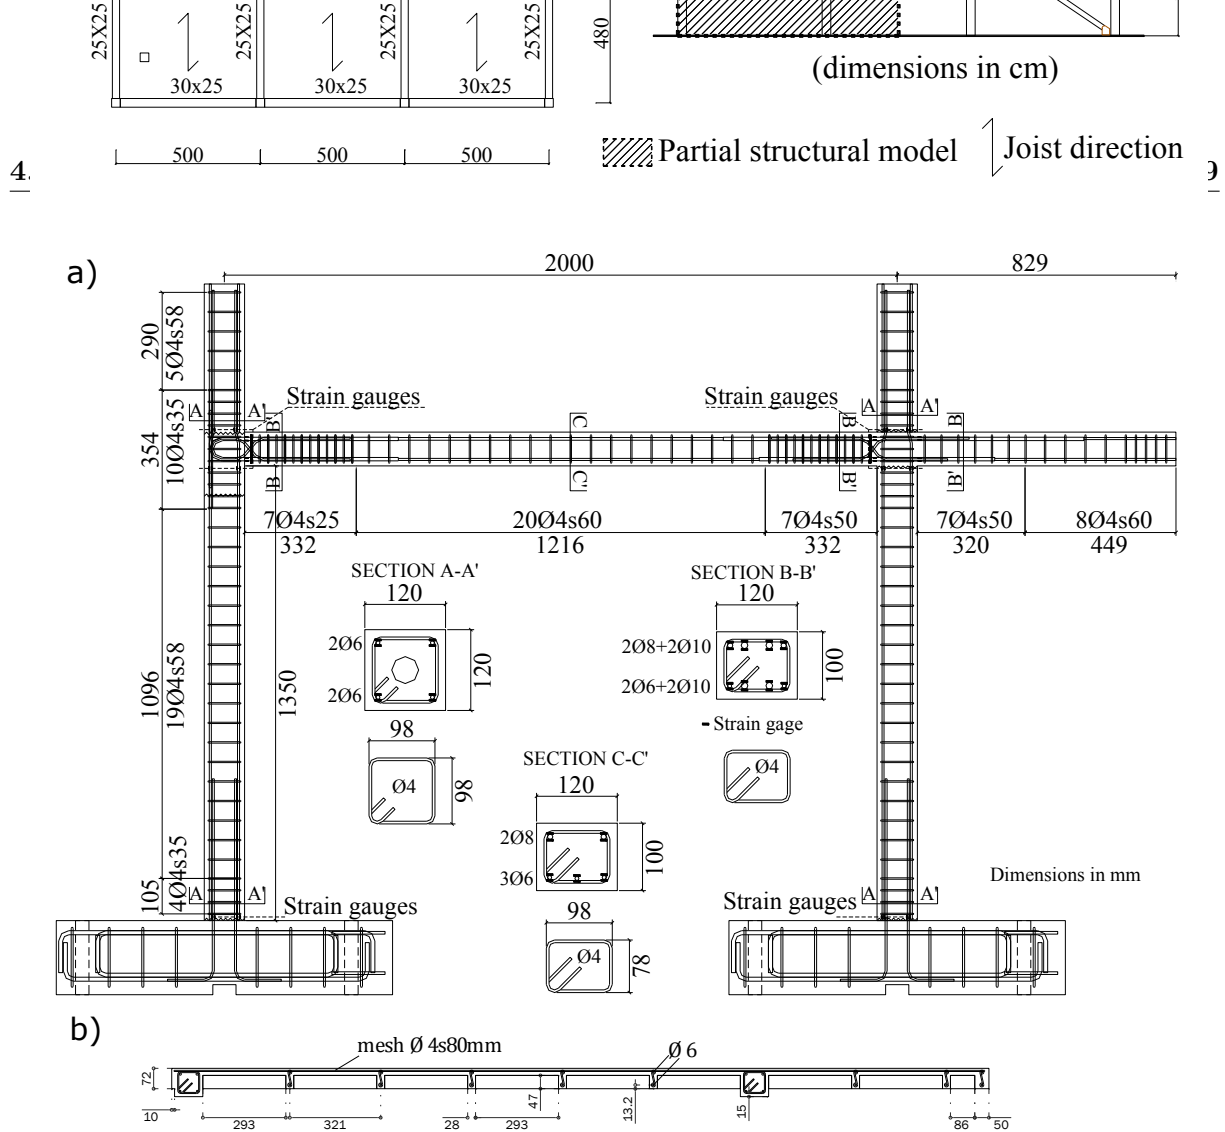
Detailing of the RC frames (a) and slab (b) of the test specimen.
